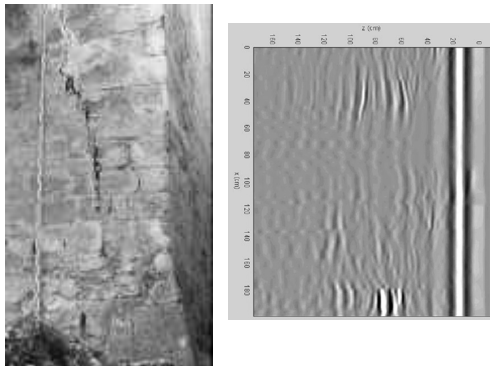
Cracks as observed on the adjacent wall and processed radar section
